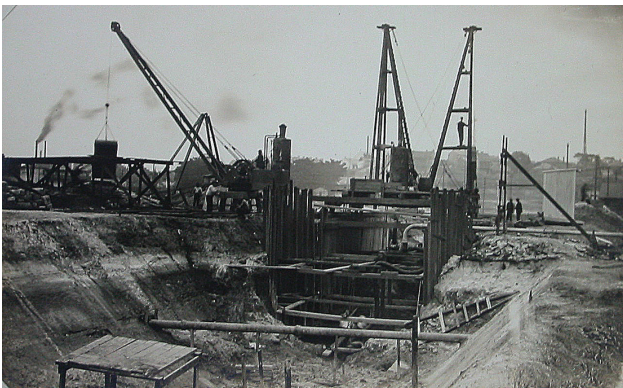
White Bay Power Station under construction, 1912 (courtesy of Powerhouse Collection).
